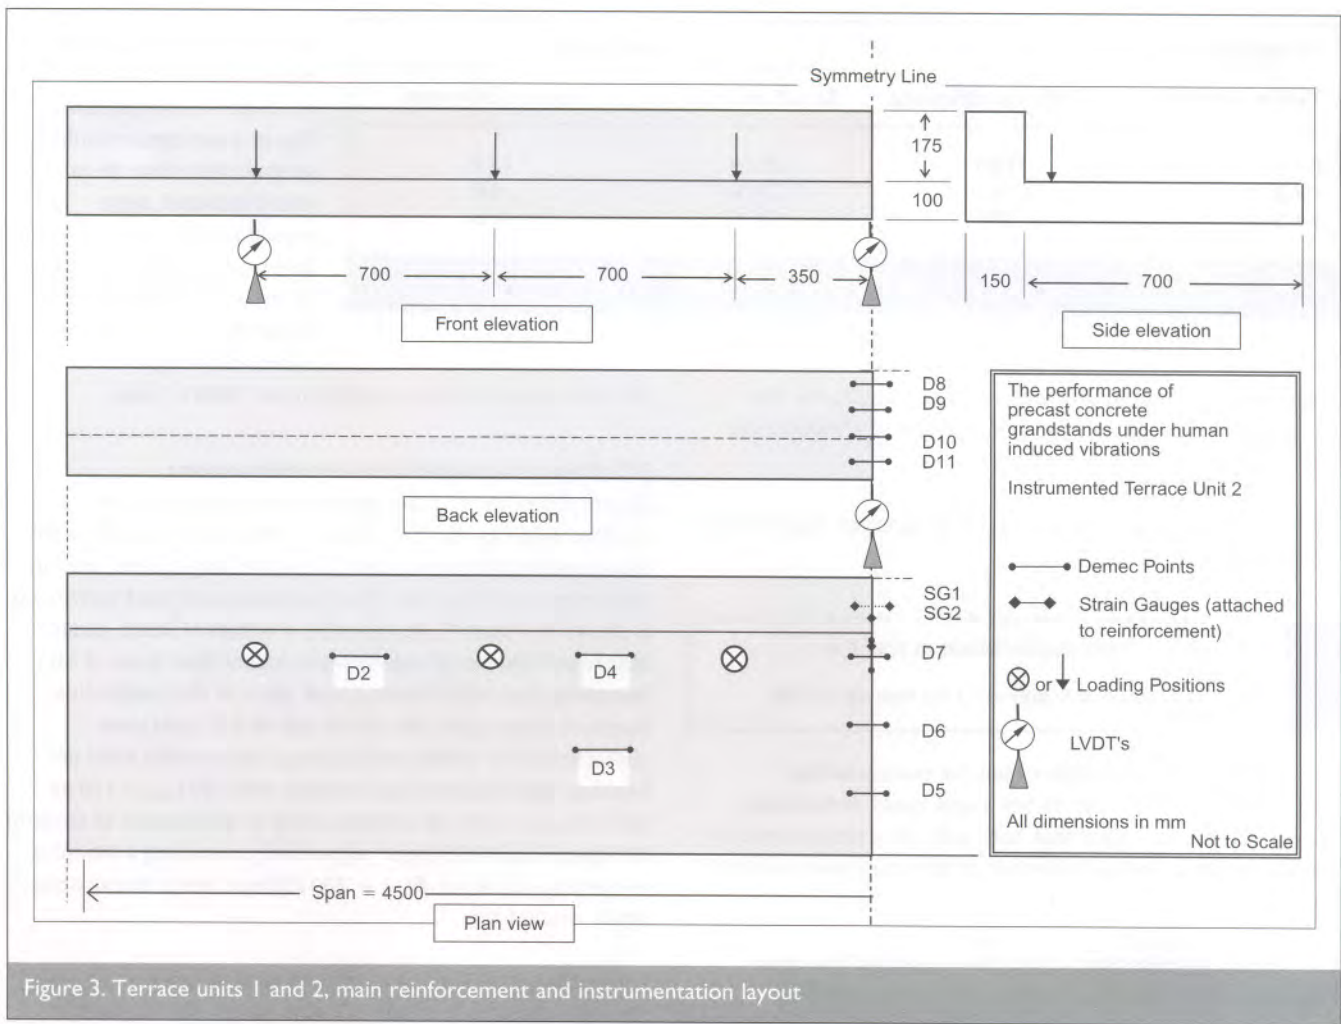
Terrace units 1 and 2, main reinforcement and instrumentation layout
